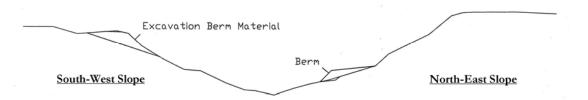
Cross-section schematic of slope excavation/berm construction at Logan County site.
